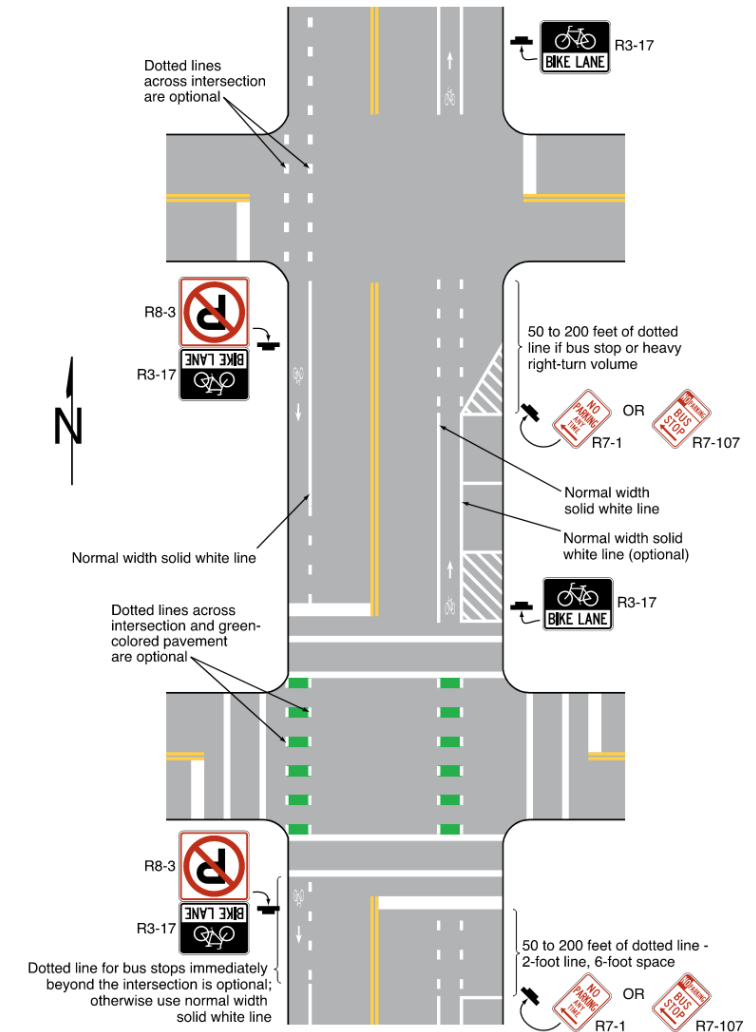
E-5. Examples of Pavement Markings for Mixing Zones
